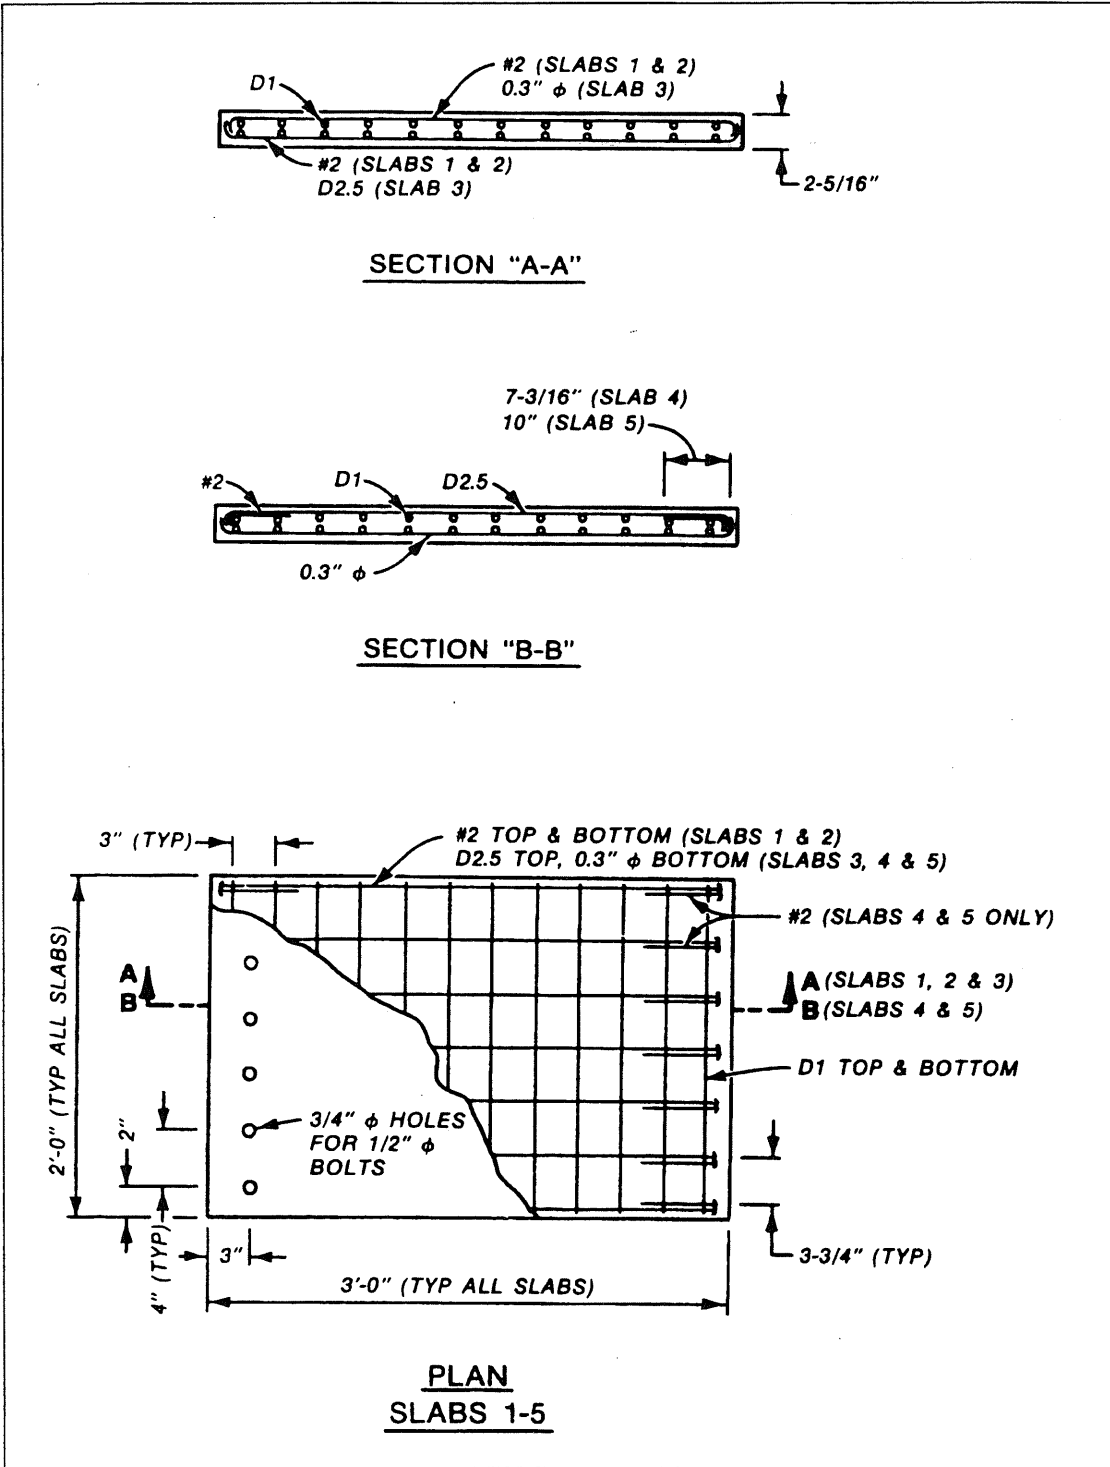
Slabs 1-5 Plan Details (Woodson et. al., 1985)
